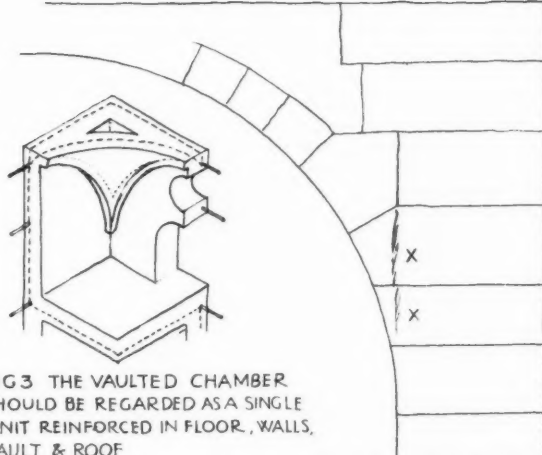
THE VAULTED CHAMBER SHOULD BE REGARDED AS A SINGLE UNIT REINFORCED IN FLOOR, WALLS, VAULT & ROOF
